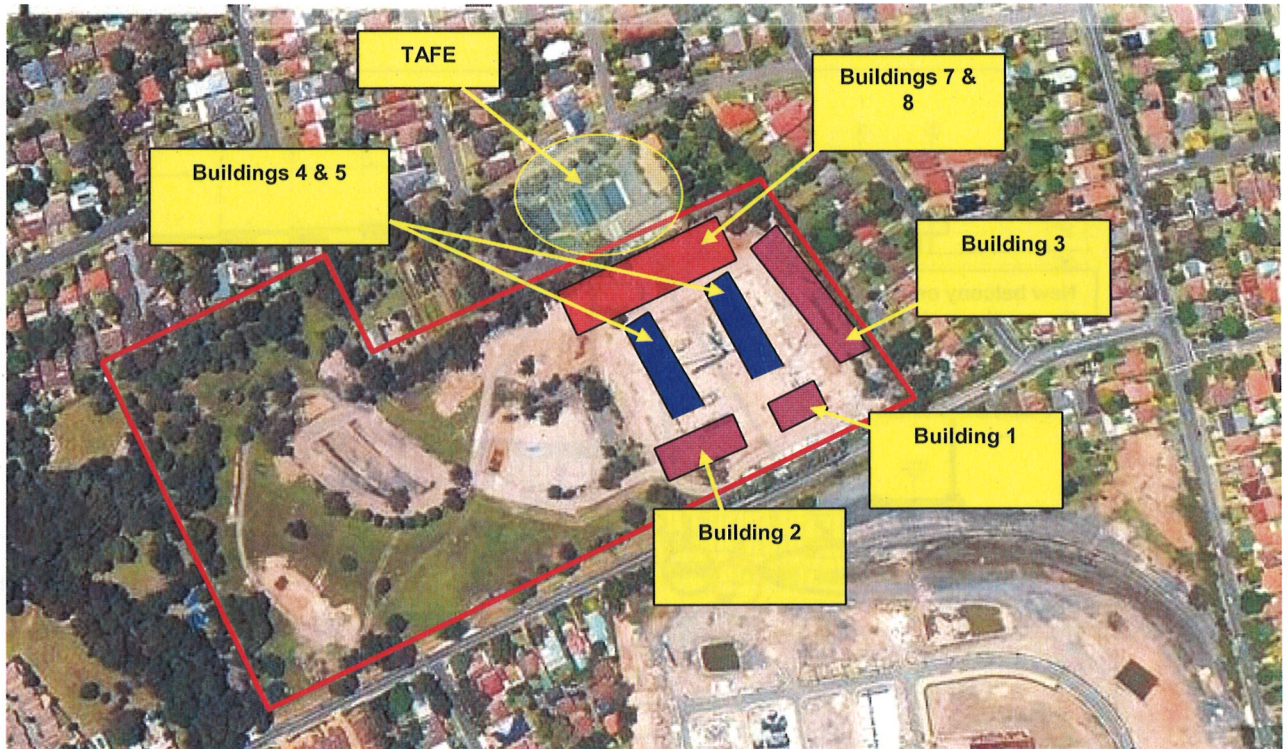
Aerial view identifying the envelopes of the buildings approved under the Concept Plan
